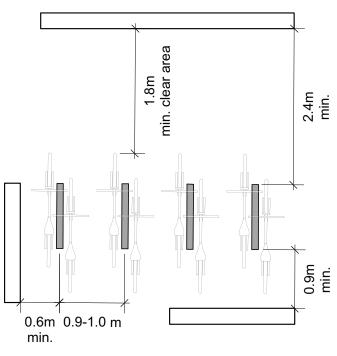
Bicycle parking rack minimum spacing from walls, obstructions, and property lines
